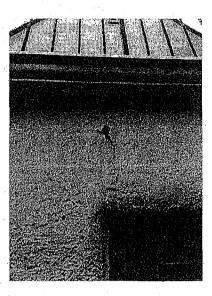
, 2, 3: Areas at the rear of the house with stucco damage and underlying dry rot.
